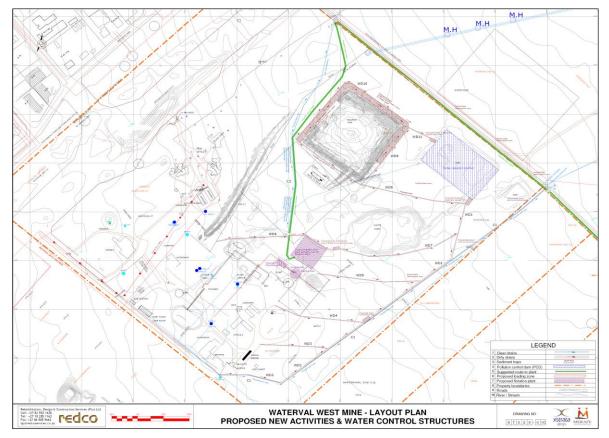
Surface layout plan for Waterval West – Including PGM Project (Shangoni, 2021)
